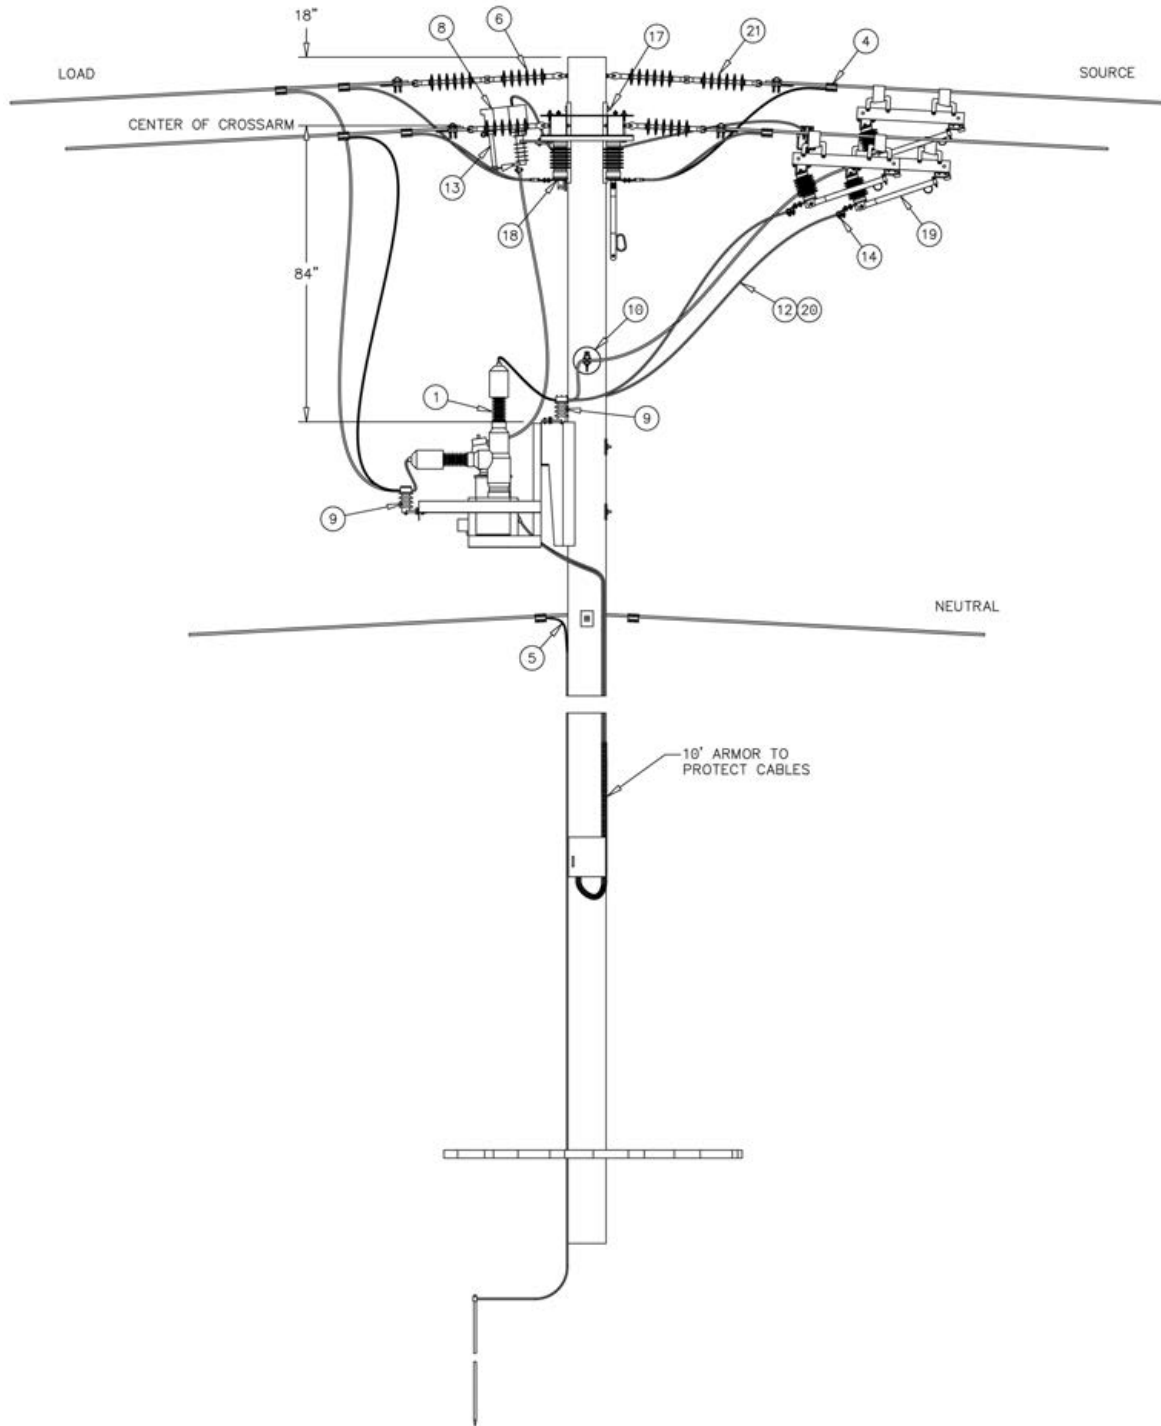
Typical Recloser Assembly, Above 200 A Load, Front View
